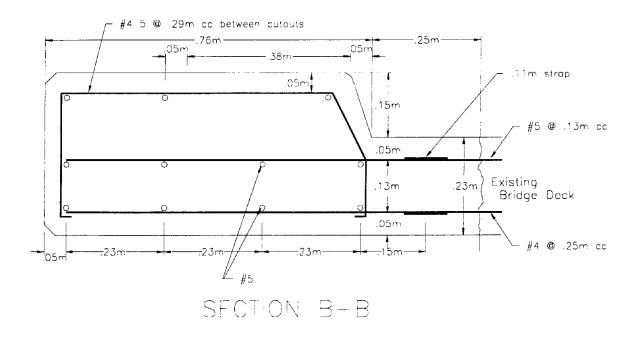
Steel reinforcement details for Washington, DC, historic bridge rail (continued).
